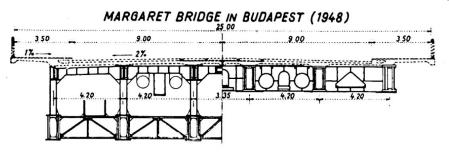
Cross sections showing welded deck - girders of the most recent Hungarian Danube and T i s z a bridges.
